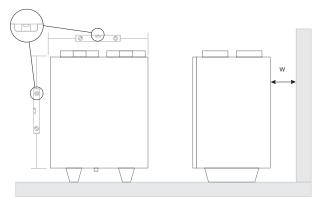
Horizontal floor-mounting positions on floor (W=400 mm)
